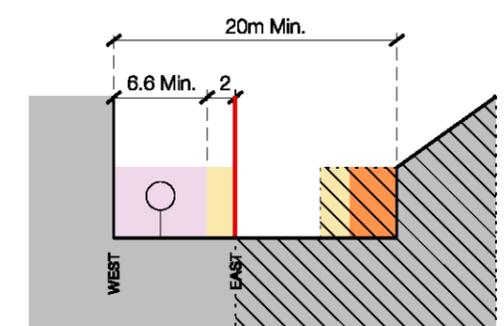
Stitching coding section: Plot J across to Cambridge Grove Road.
